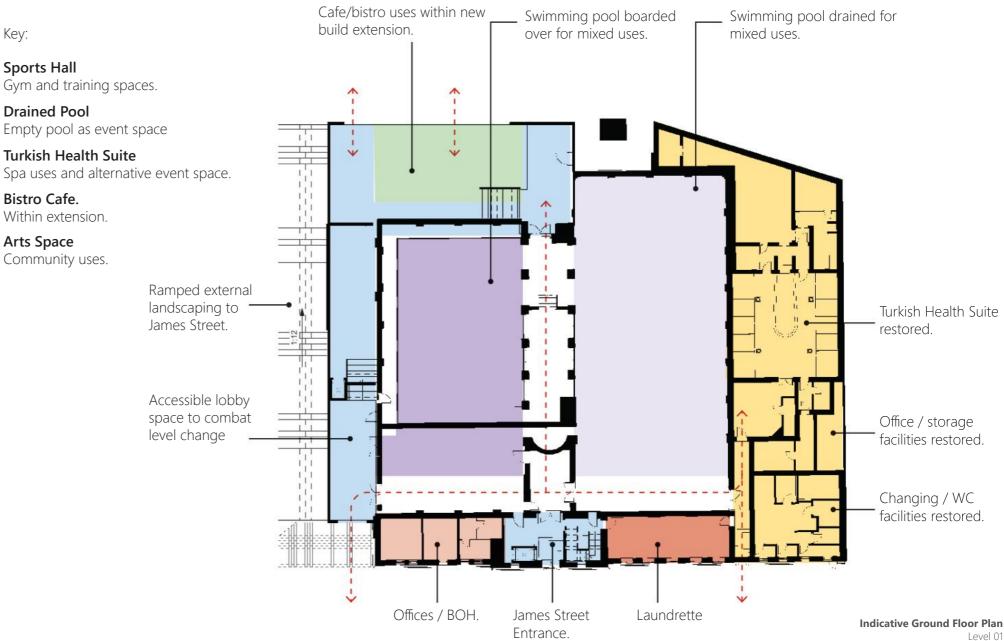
Ground Floor Plan, option 2, indicative use layout as proposed Level 00
